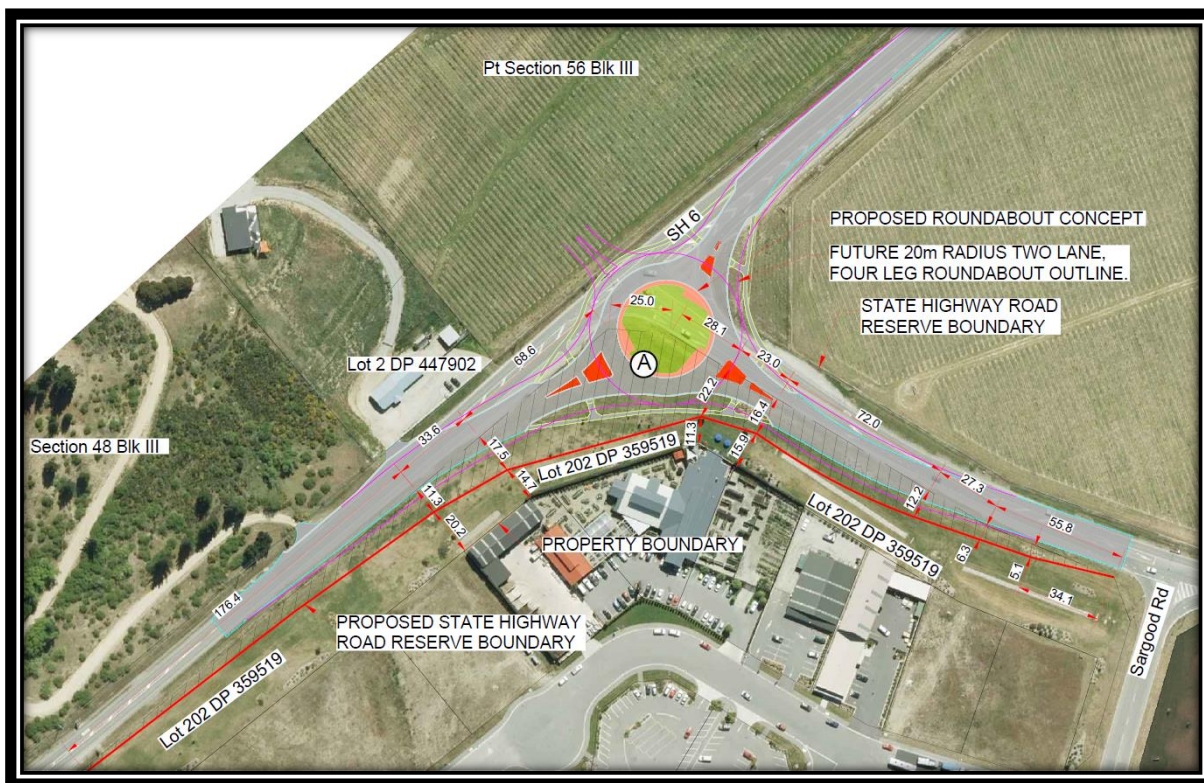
Concept Plan: SH6 – SH8B Junction Cromwell Intersection Upgrade
